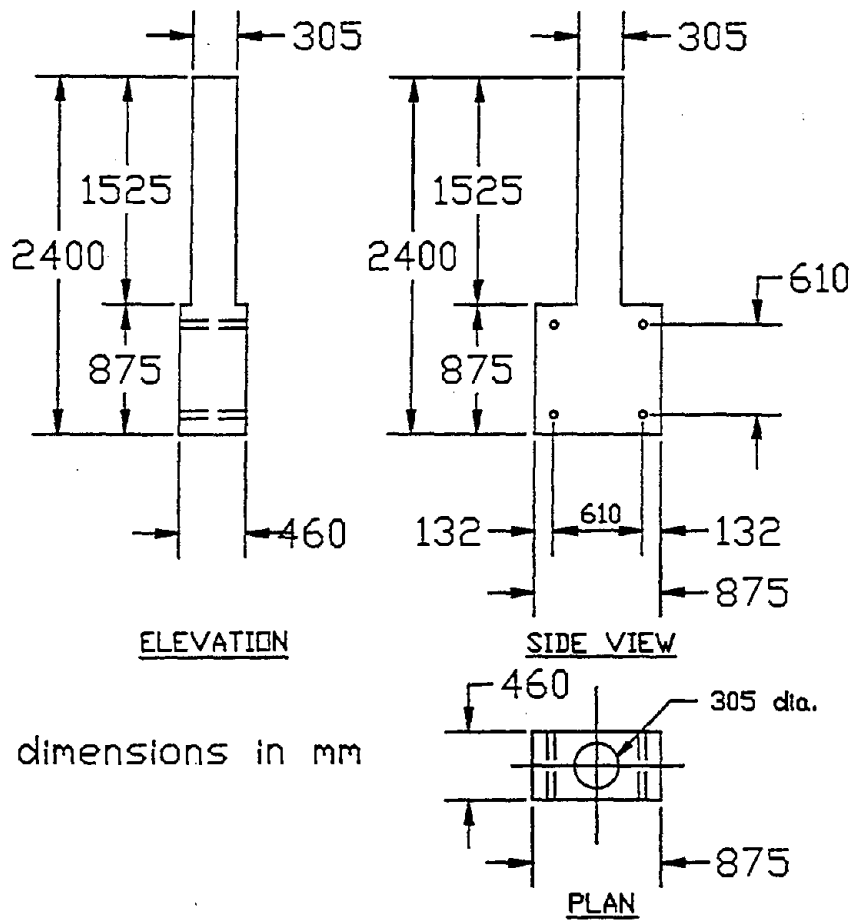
Configuration and Dimensional Details of Specimen with Base Block
